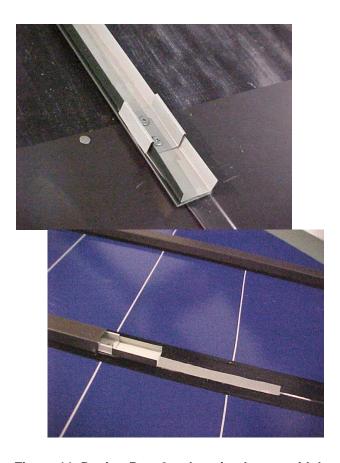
Design Rev. 2—clamping batten with base channel clamping strip eliminated Photo Credit: Uni-Solar
